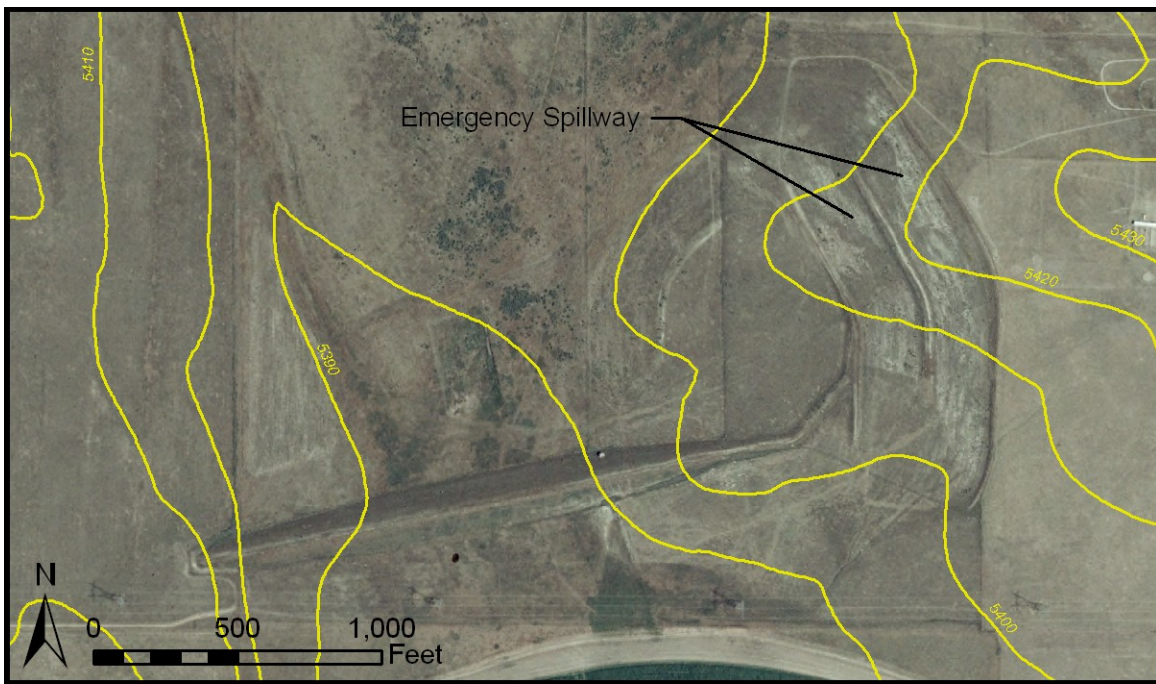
B-4 embankment. Aerial photography taken summer of 2005. Pre-construction 10-foot contour intervals shown.
